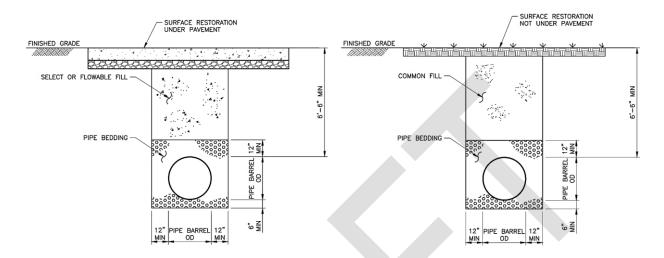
Pipeline Trench Sections Beneath and Beyond Pavement
